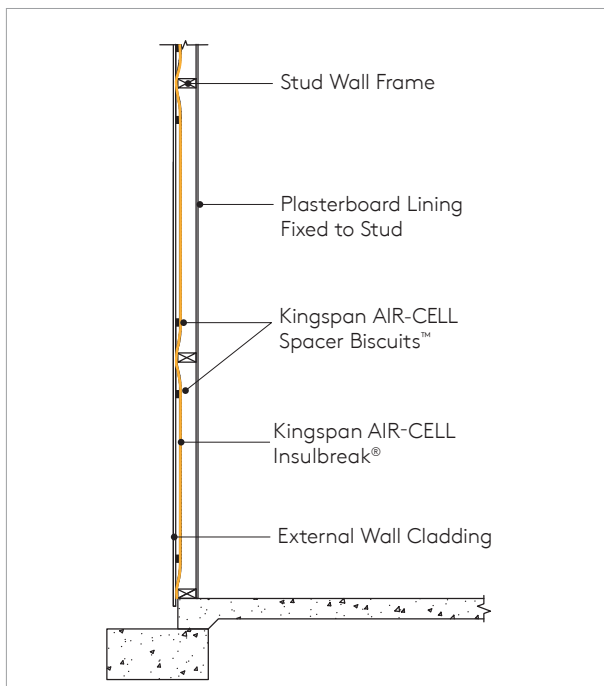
Side elevation of Kingspan AIR-CELL Insulbreak® on steel-framed wall.
